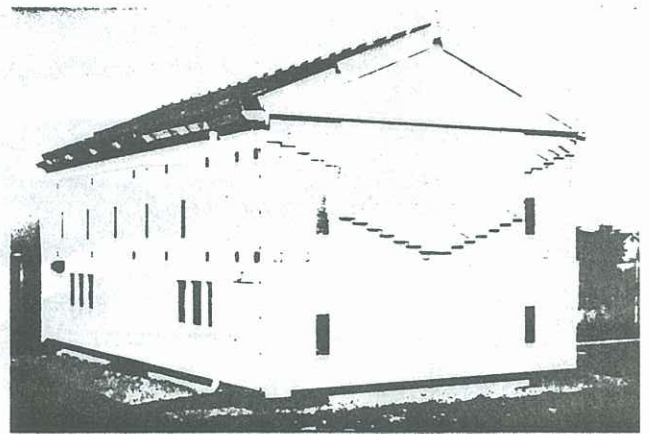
The Aylesbury house (roof pitch $22\ 1/2^\circ$)
